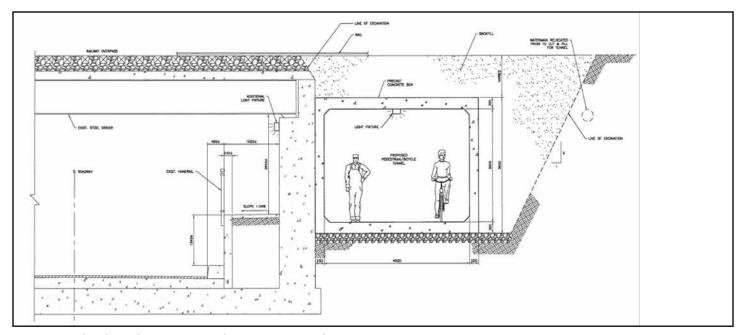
Shaughnessy St Underpass – Tunnel Cross Section
